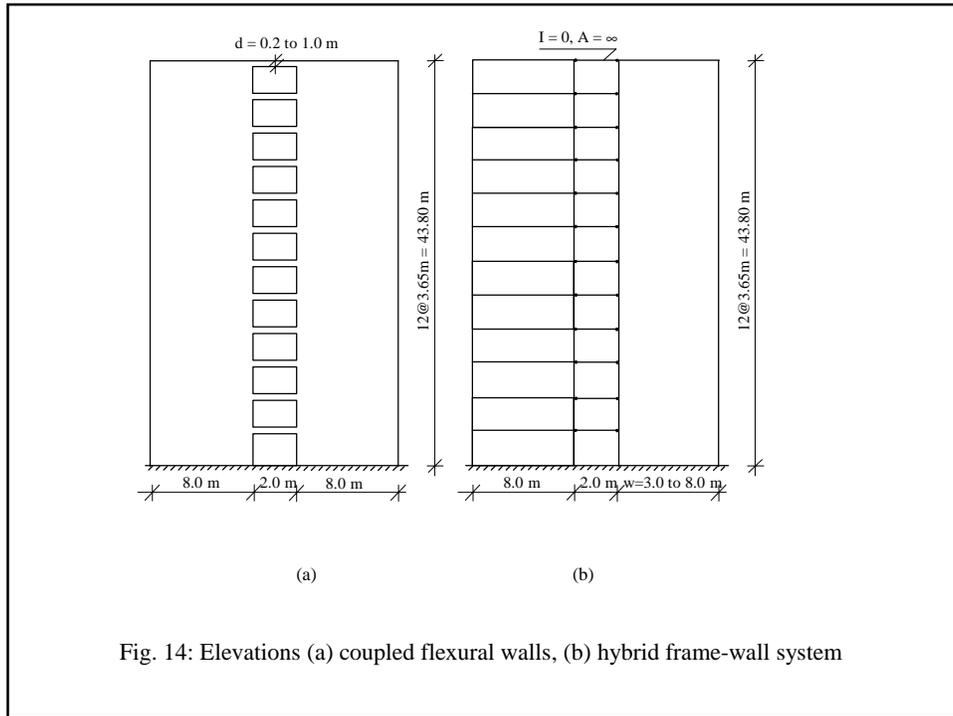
Elevations (a) coupled flexural walls, (b) hybrid frame-wall system
